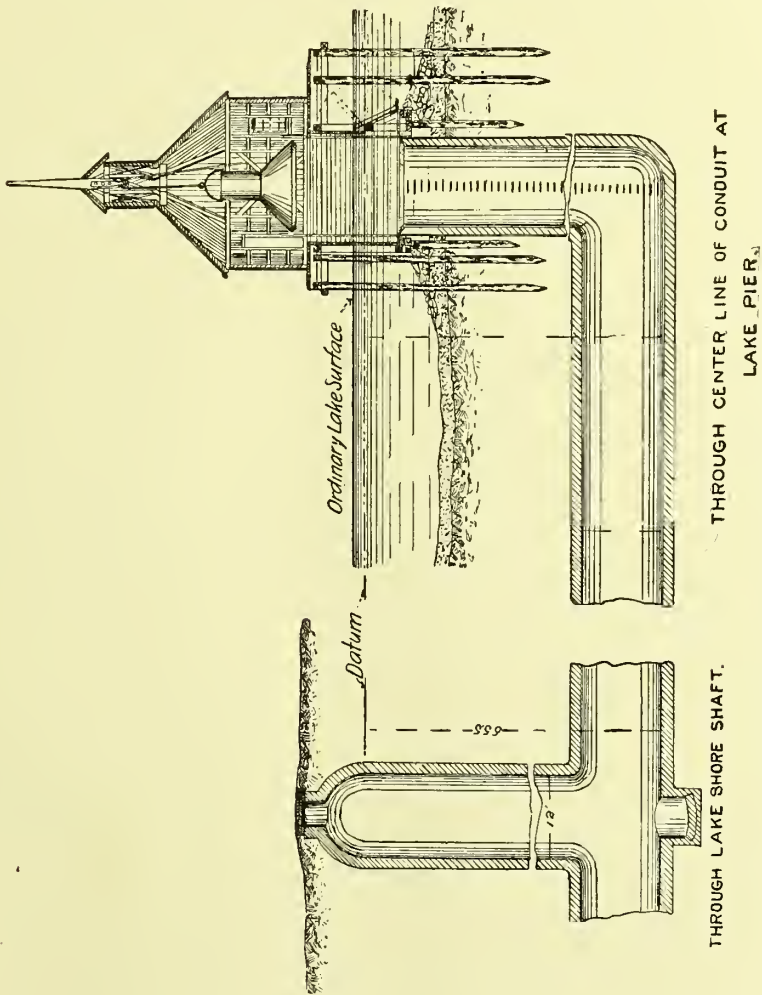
SECTIONS THROUGH FULLERTON AVENUE CONDUIT, CHICAGO.
